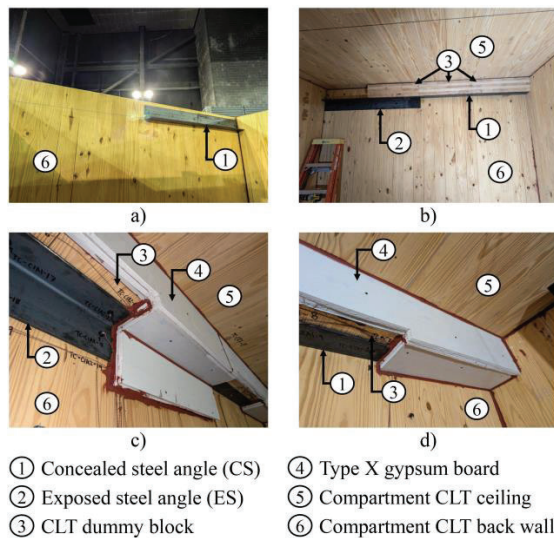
Construction stages of floor-to-wall connections. a) Placement of the concealed steel angle (CS) before installing the compartment ceiling; b) Installation of the CLT dummy block; c) Completed configuration of ES; d) Completed configuration of CS.
